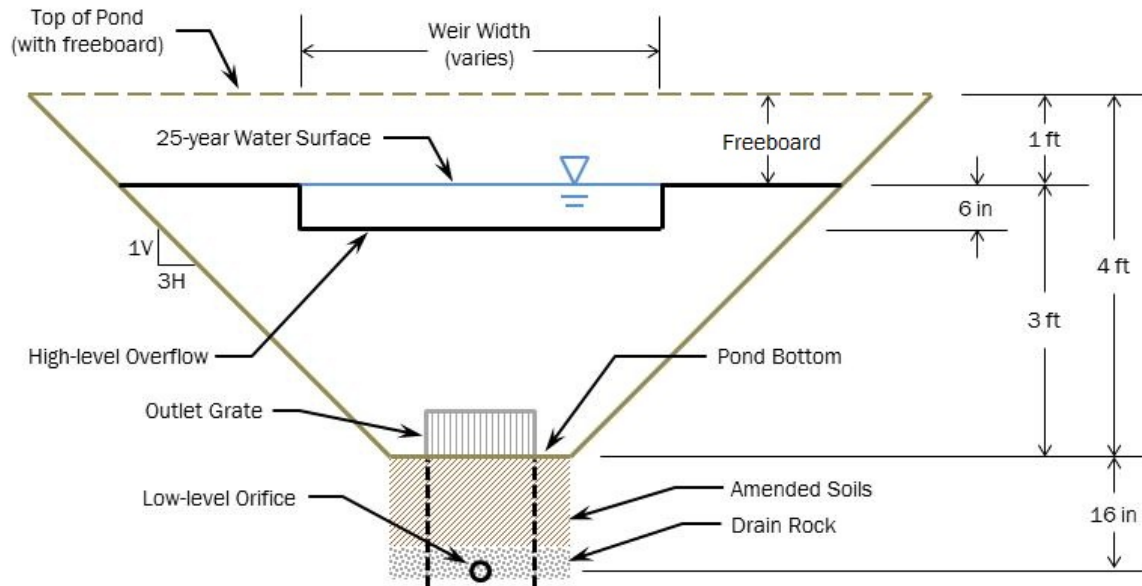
Conceptual sketch of pond depth and outlet elevations
